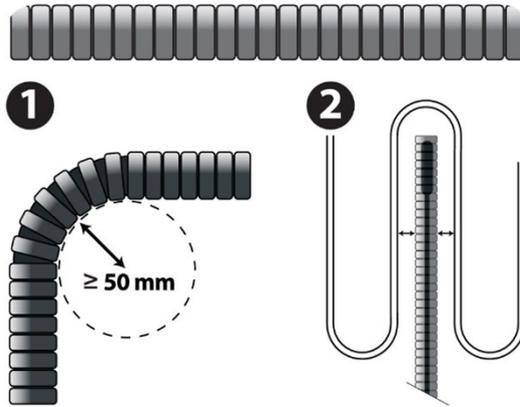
minimum Flexpipe bend (1) and Flexpipe location in between the cable (2)
